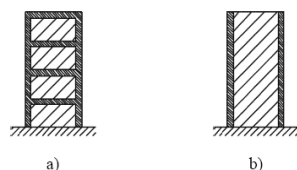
Composite structural systems. Composite walls: a) Type 1 – steel or composite moment frame with connected concrete infill panels; b) Type 2 – composite walls reinforced by connected encased vertical steel sections.
